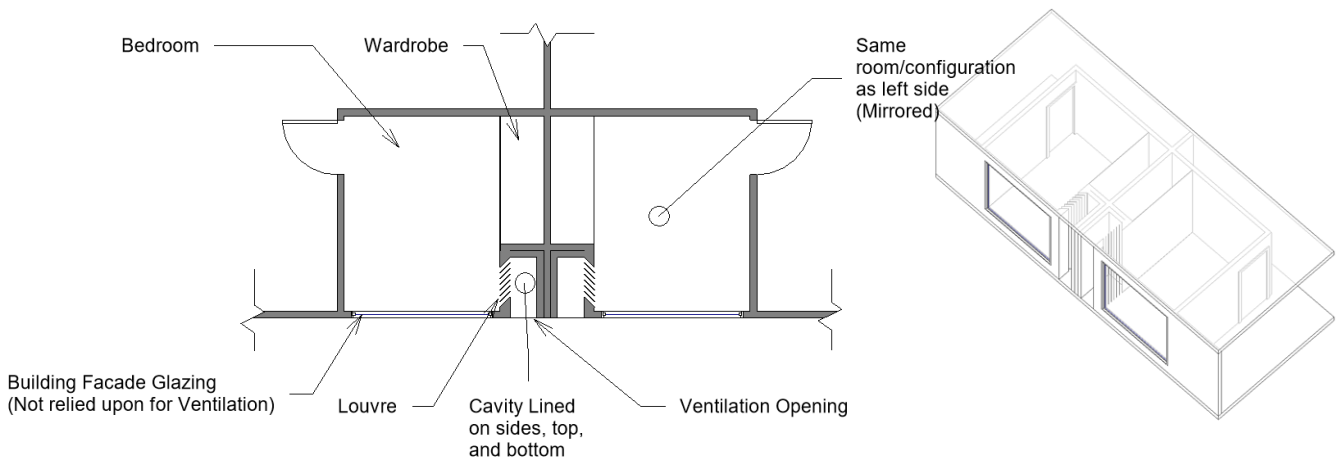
Arrangement of louvres behind acoustic opening and within a building.
